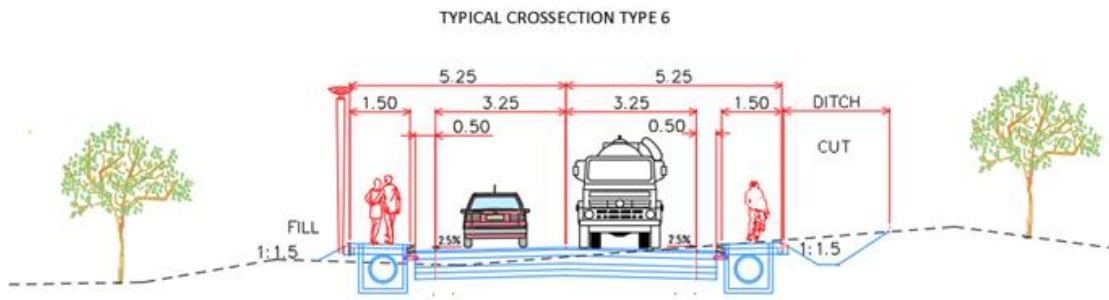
Typical cross sections Type 6 for Collector roads (Urban Area)
